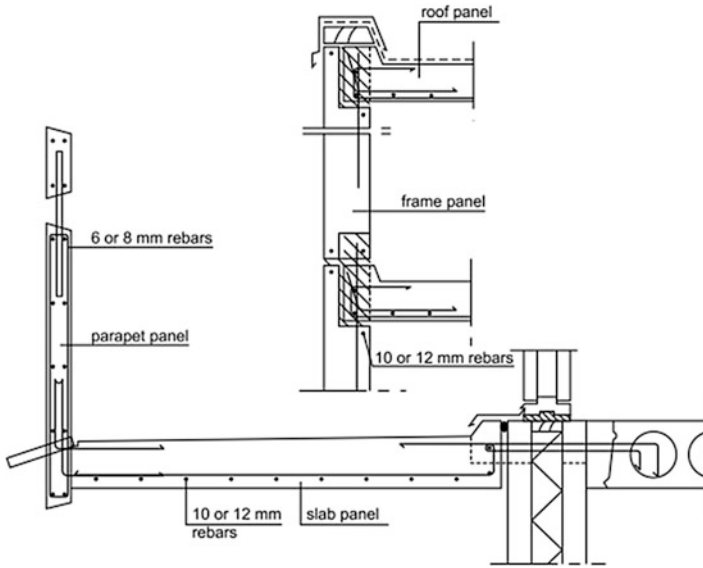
Cross-section of a typical finnish balcony made of precast structural members (Pentti 1994)
